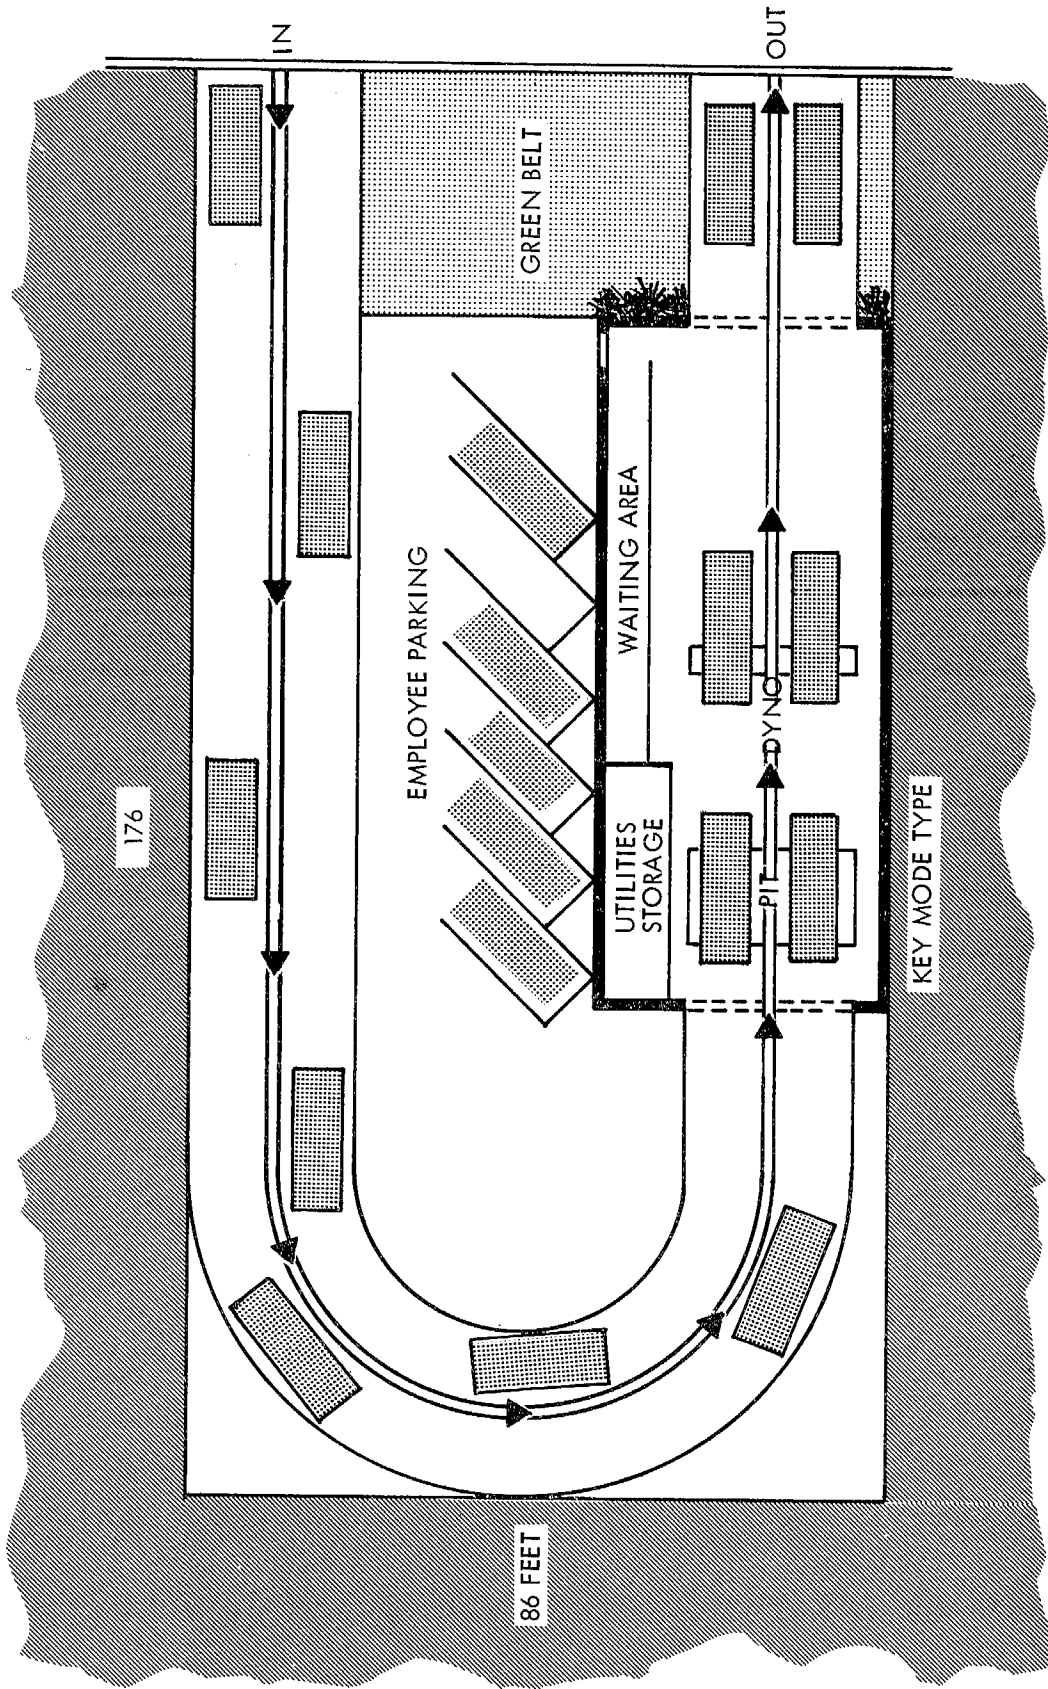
TWO-LANE STATION FLOOR PLANS (Sheet 2 of 3)
